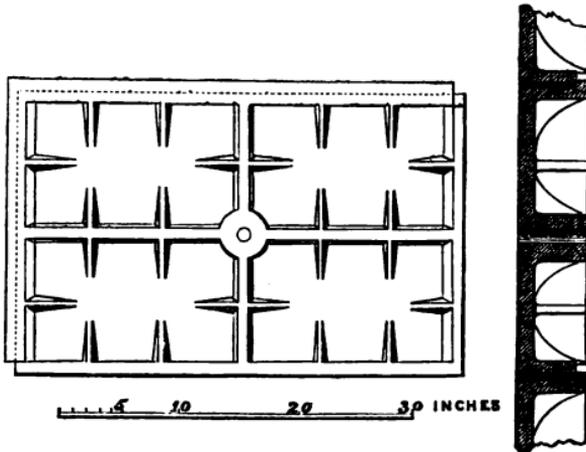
Cast-iron Tubbing Plate, in elevation and cross-section.
